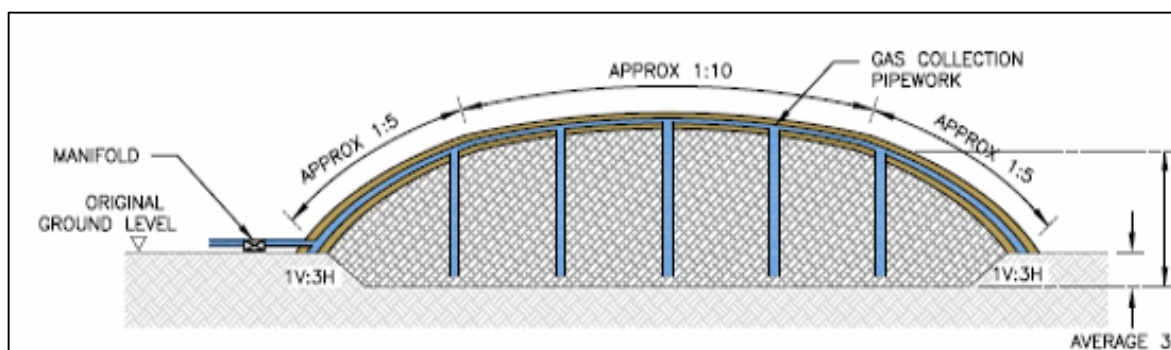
Typical Cross Section of the Cell in the New Landfill Site
